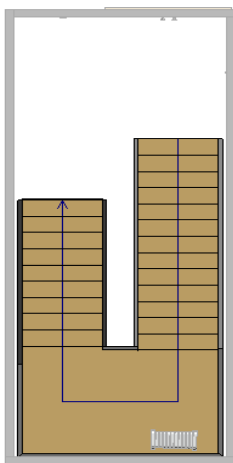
3D BIM Revit Model showing internal stairs at University of East London
